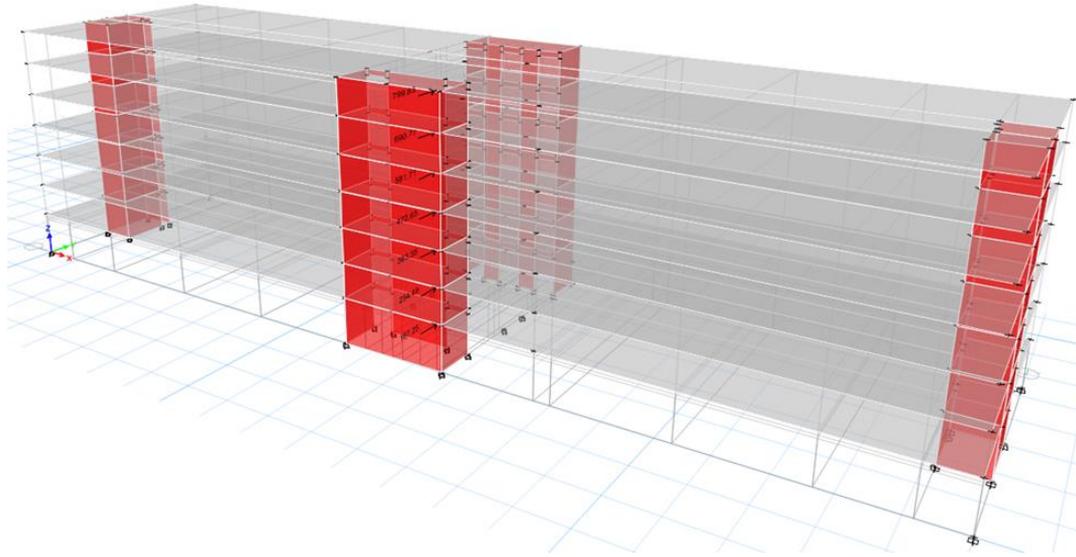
ETABS computer model of residential building subjected to elevated seismic loads to meet the tsunami demand at the Hilo location
